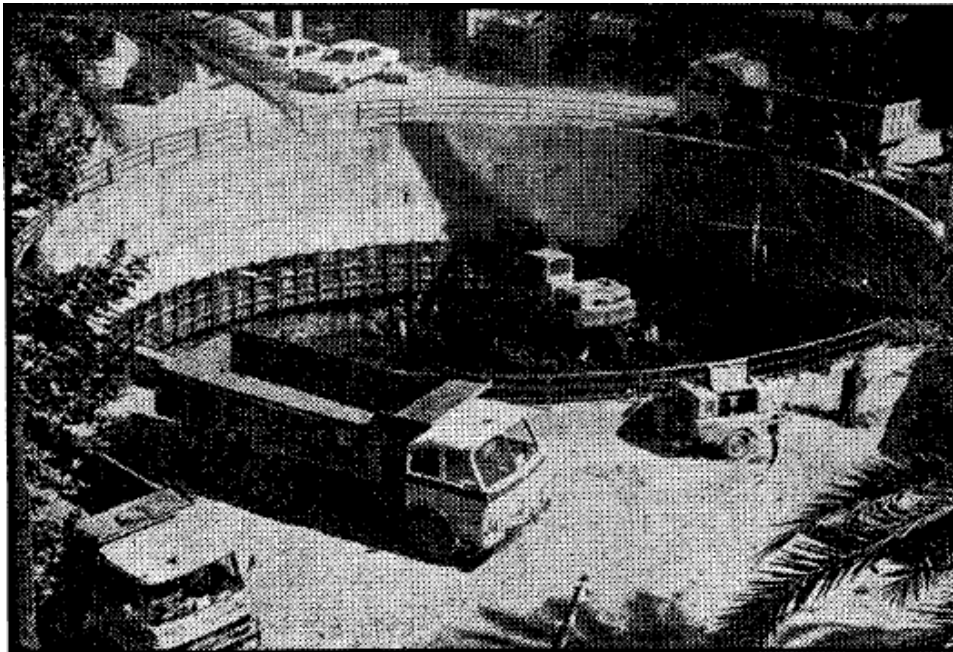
1981 newspaper photograph of the tunnel pit works at Plaza Nueva. Note the crane excavator in action at the centre of the pit (*ABC Sevilla*, 4 September 1981).
